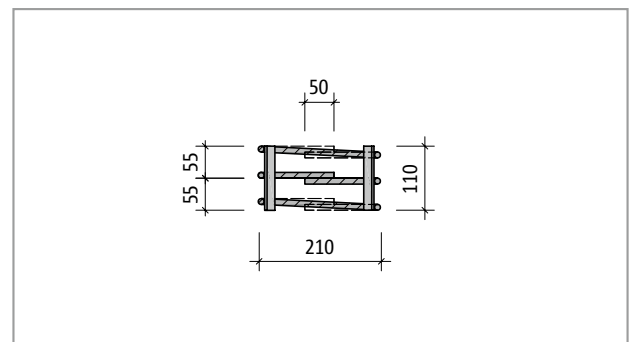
Schöck Sconnex® type P: Side view Part T; welded stirrup and bending form segments made of stainless steel
